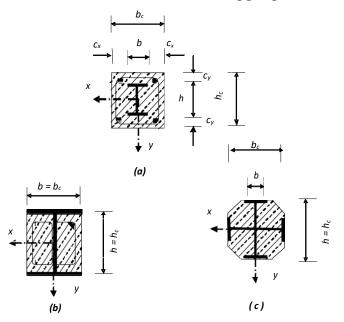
Typical Cross - Sections of Fully and Partially Concrete Encased Columns
